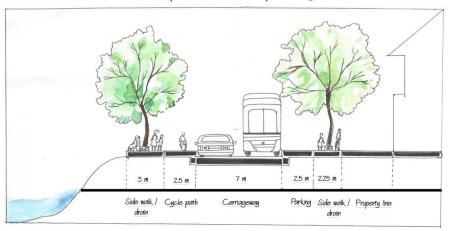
Cross-section of 1st Priority Road Source : Urban Development Authority Scale 1:100
